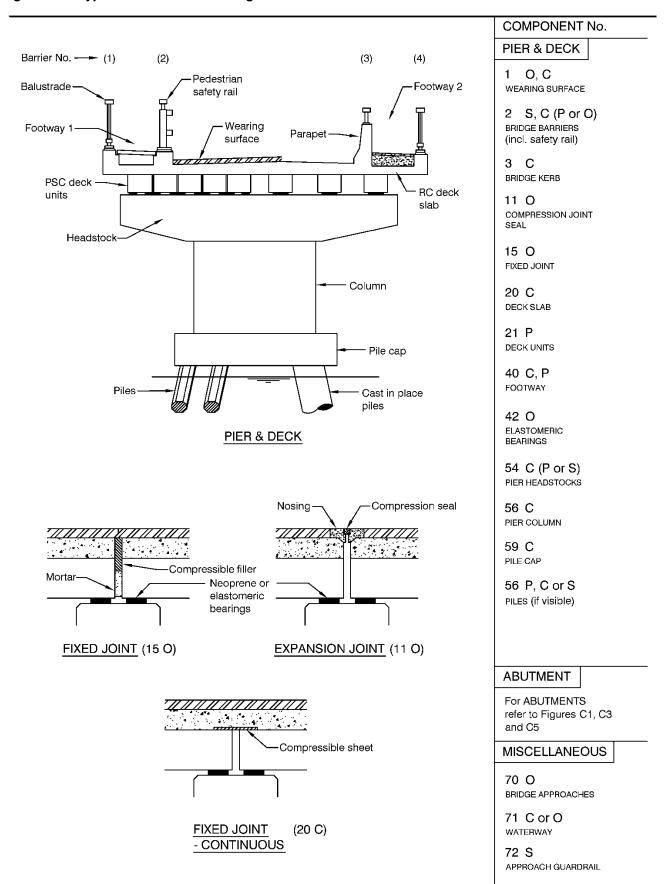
TYPICAL PSC DECK UNIT BRIDGE 2
